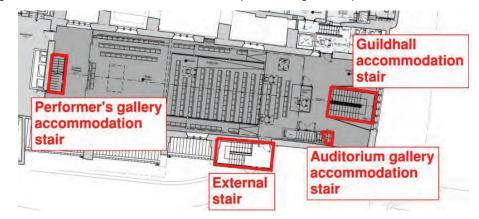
Stairs within the Guildhall enclosure (shown on the first floor)
